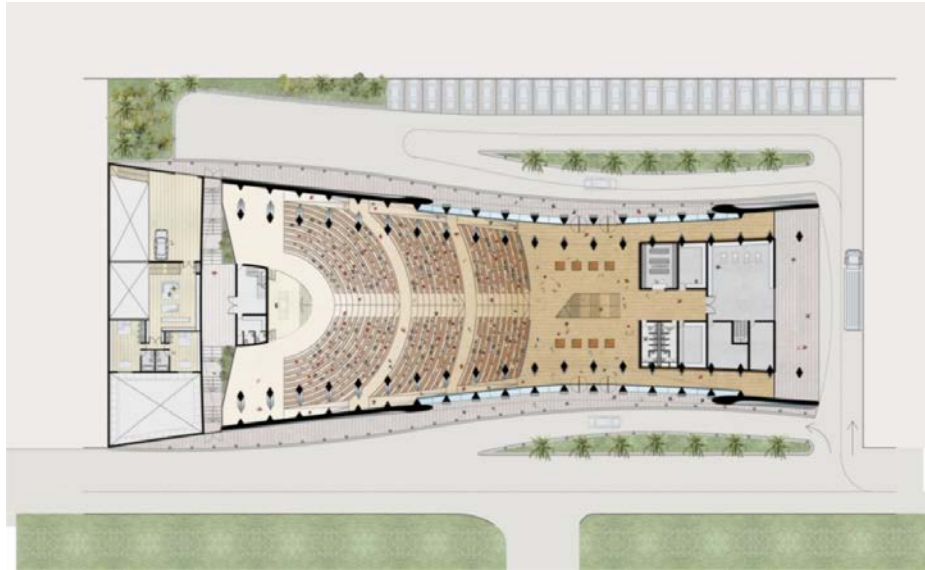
Floor Plan of the Church of Resurrection at Lekki, Lagos
